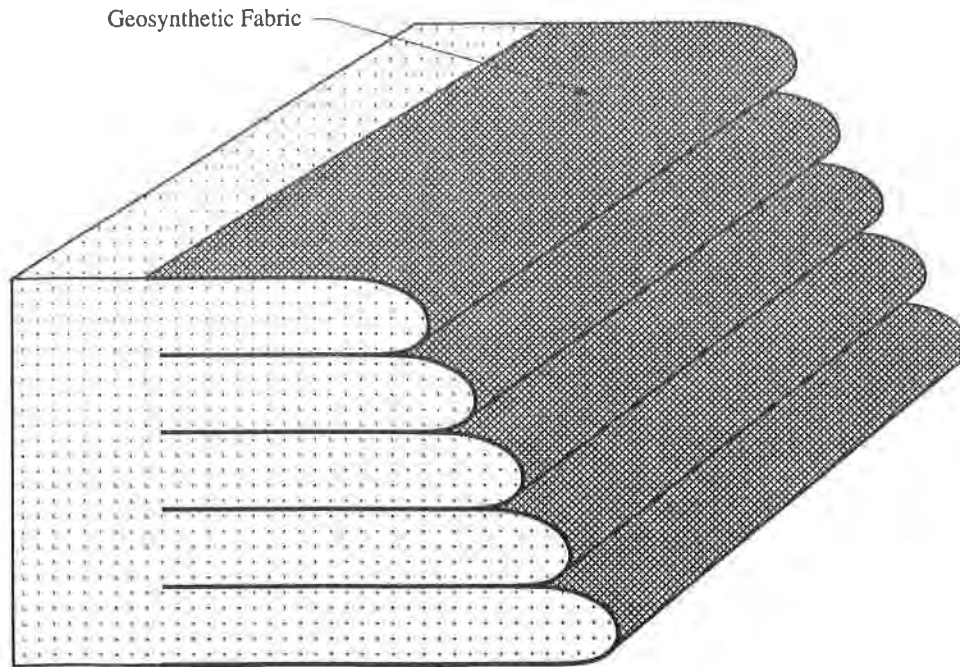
Schematic of a “face wrapped” geogrid/geotextile reinforced embankment
